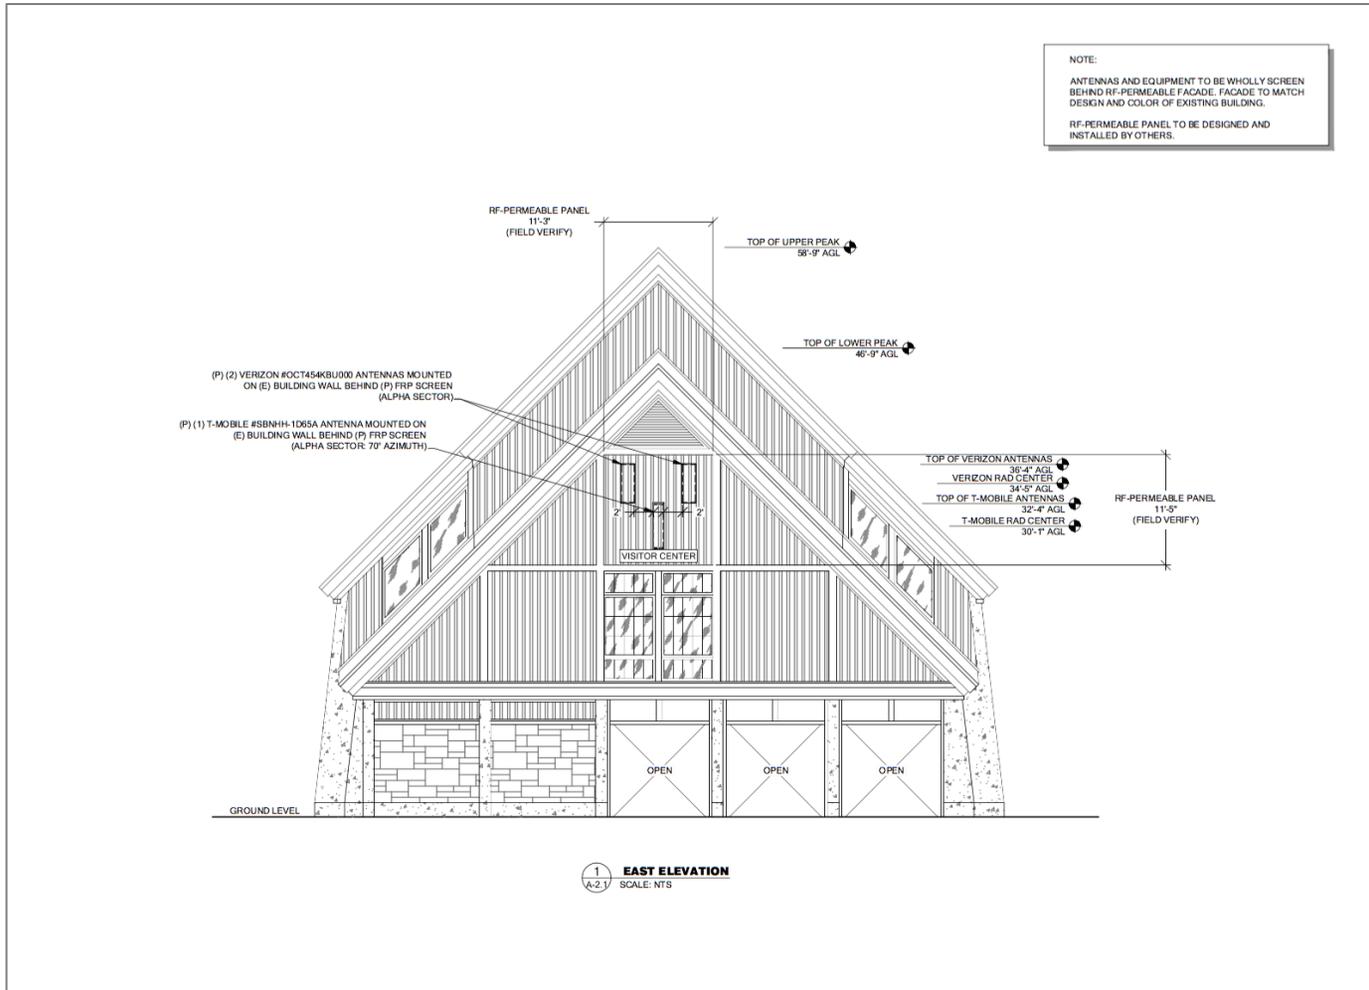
Jackson Visitor Center east elevation (looking west) showing RF Panel and antenna mounting locations. Antennas would be mounted in the building, and to the back of the panels, which are designed to be permeable. Antennas would be shielded from view.
